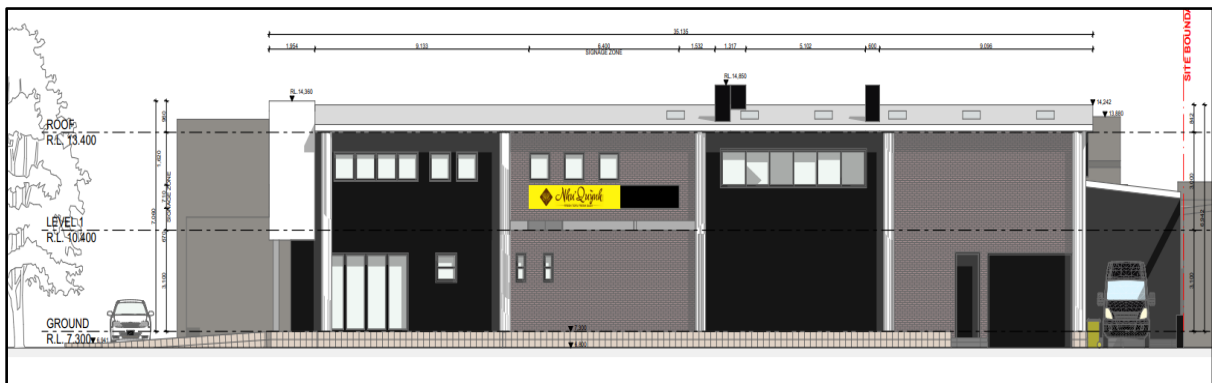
The proposed building elevation fronting Adept Lane (not to scale)
